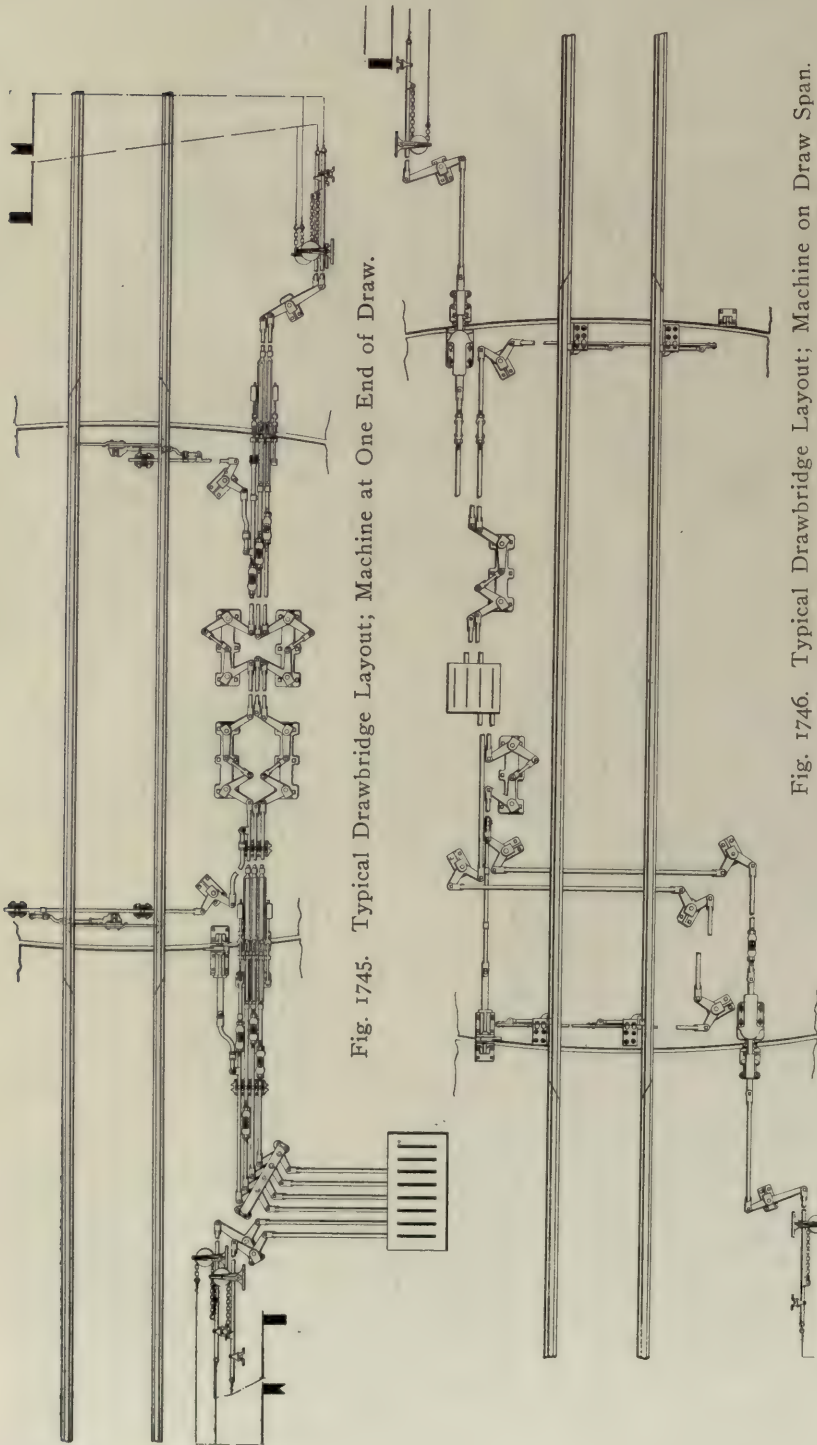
Typical Drawbridge Layout; Machine at One End of Draw.
